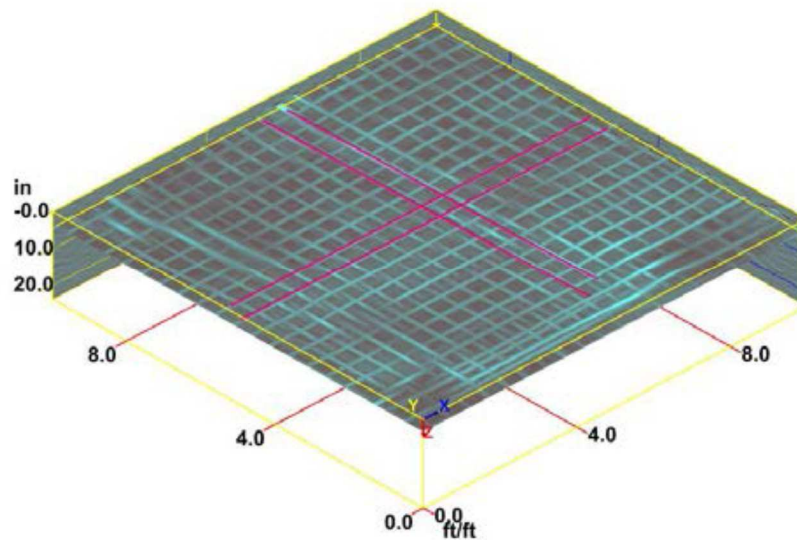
GPR C-Scan or 3-D view (GSSI Concrete Handbook, 2015)
